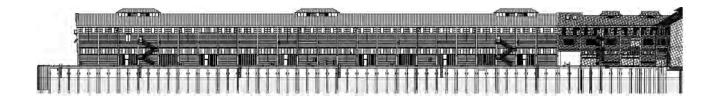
Existing and proposed west elevation to Pier 2/3 (proposed alterations shown in blue)
